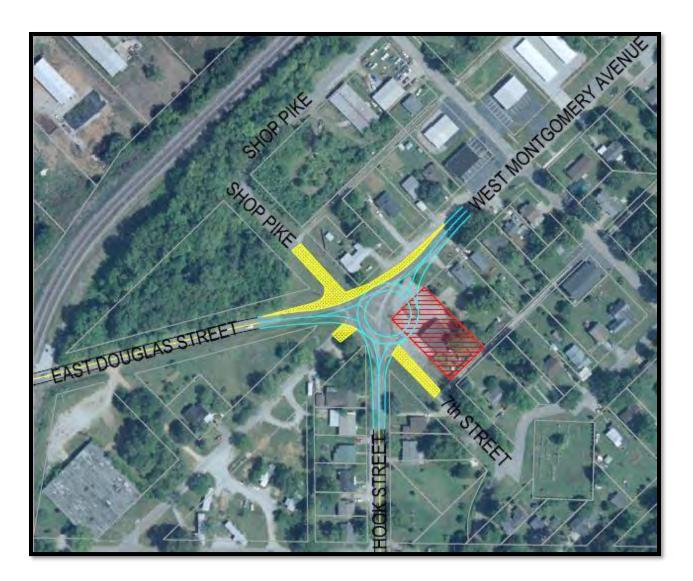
Alternative 4 – Roundabout Concept at Hook St/Douglas St/West Montgomery Ave
